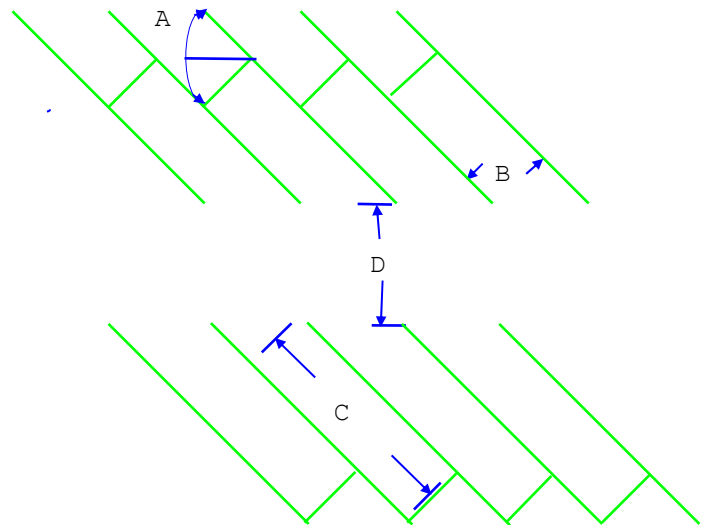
PARKING LAYOUT DIMENSIONS FOR 8.5' AND 9.0' STALL WIDTHS AT VARIOUS ANGLES WITH TWO - WAY AISLES (MINIMUM STANDARDS)
